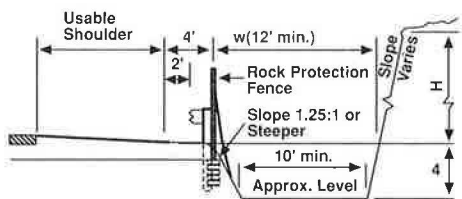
Roadway section on rock slope—Design A, Stage 3.
